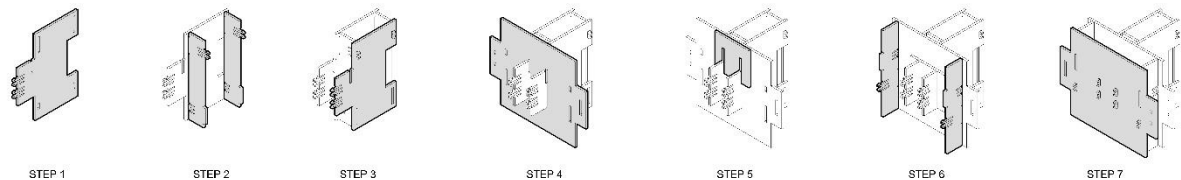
Three wall typologies assembly sequence. The assembly guide that the end user will be using would have similar schemes to guide him through the construction
